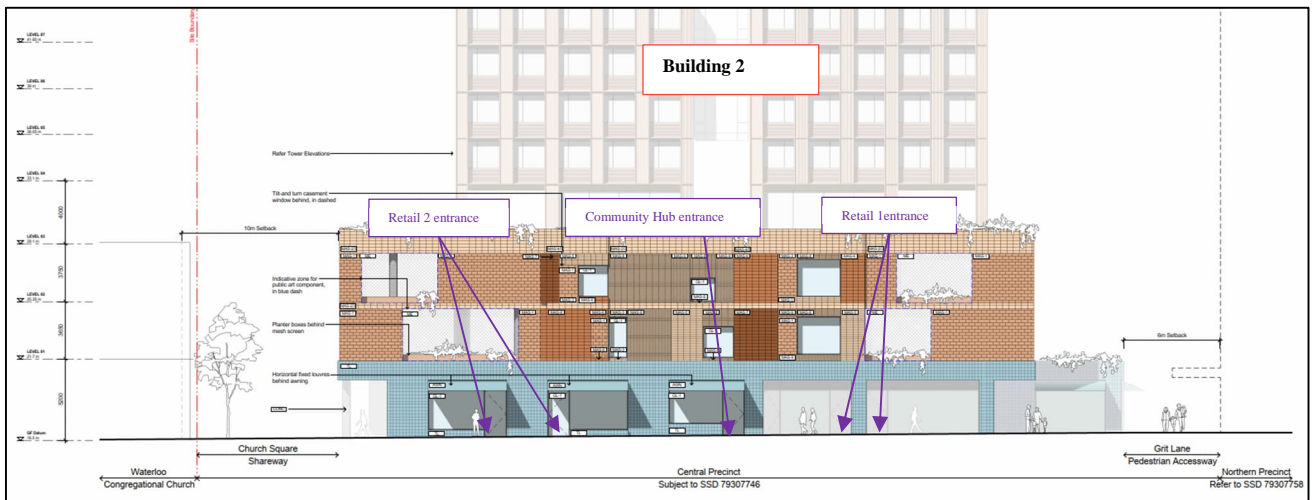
Central Precinct external elevation – east view (from Cope St Plaza)
